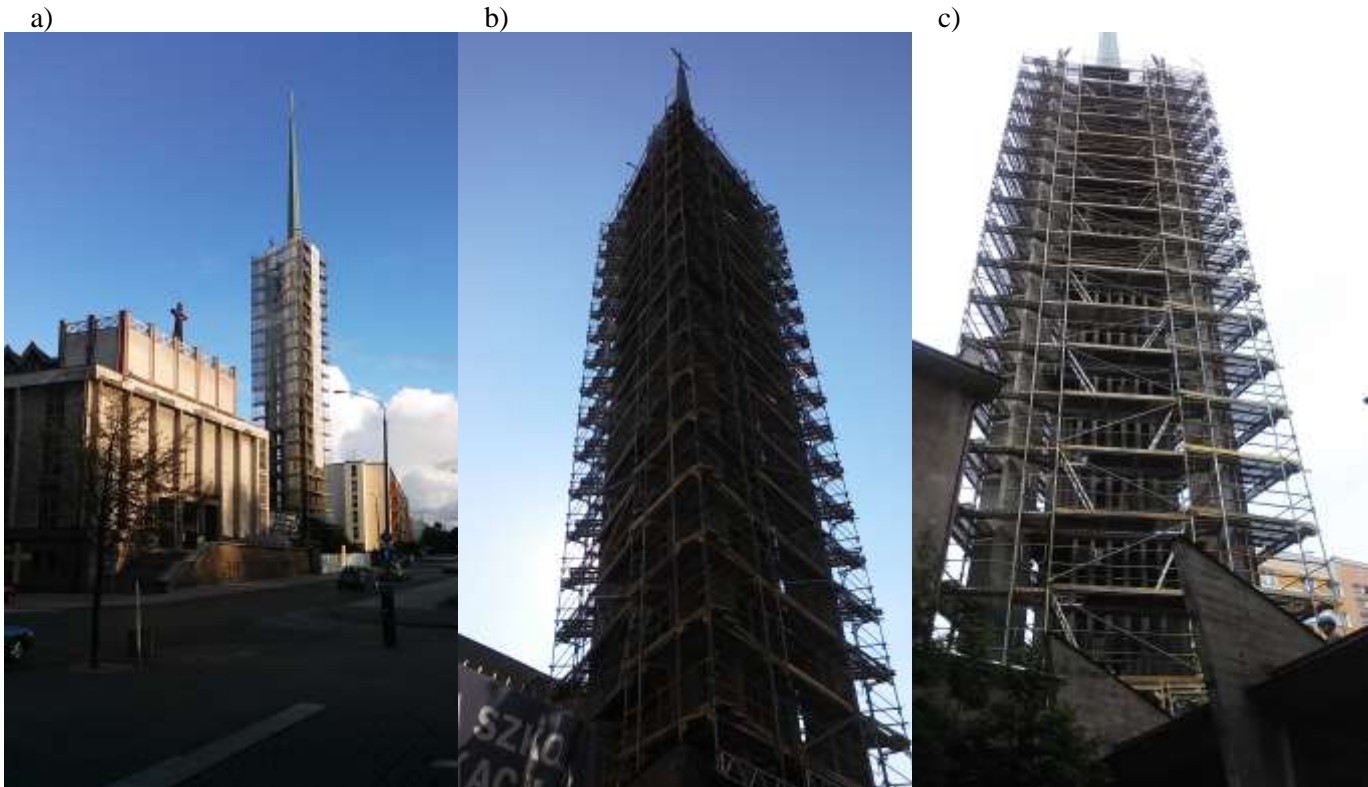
Reinforced concrete belfry tower during renovation works: a) general view, b), c) close-up details of the scaffolding (photo by Jacek Bramorski)
